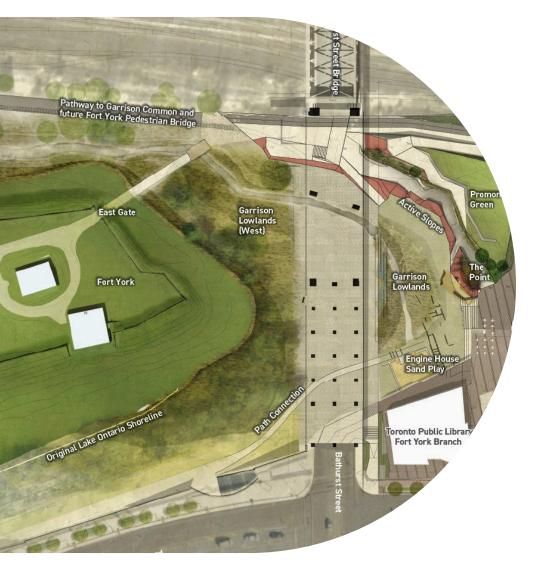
Plan rendering of the future Lower Garrison Creek Park.
